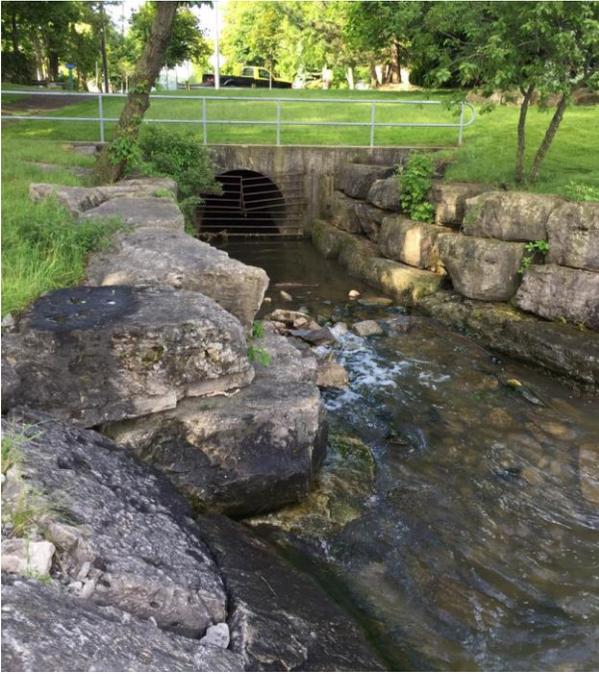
Concrete headwall with storm water pipe and grate at end of Winona Road
